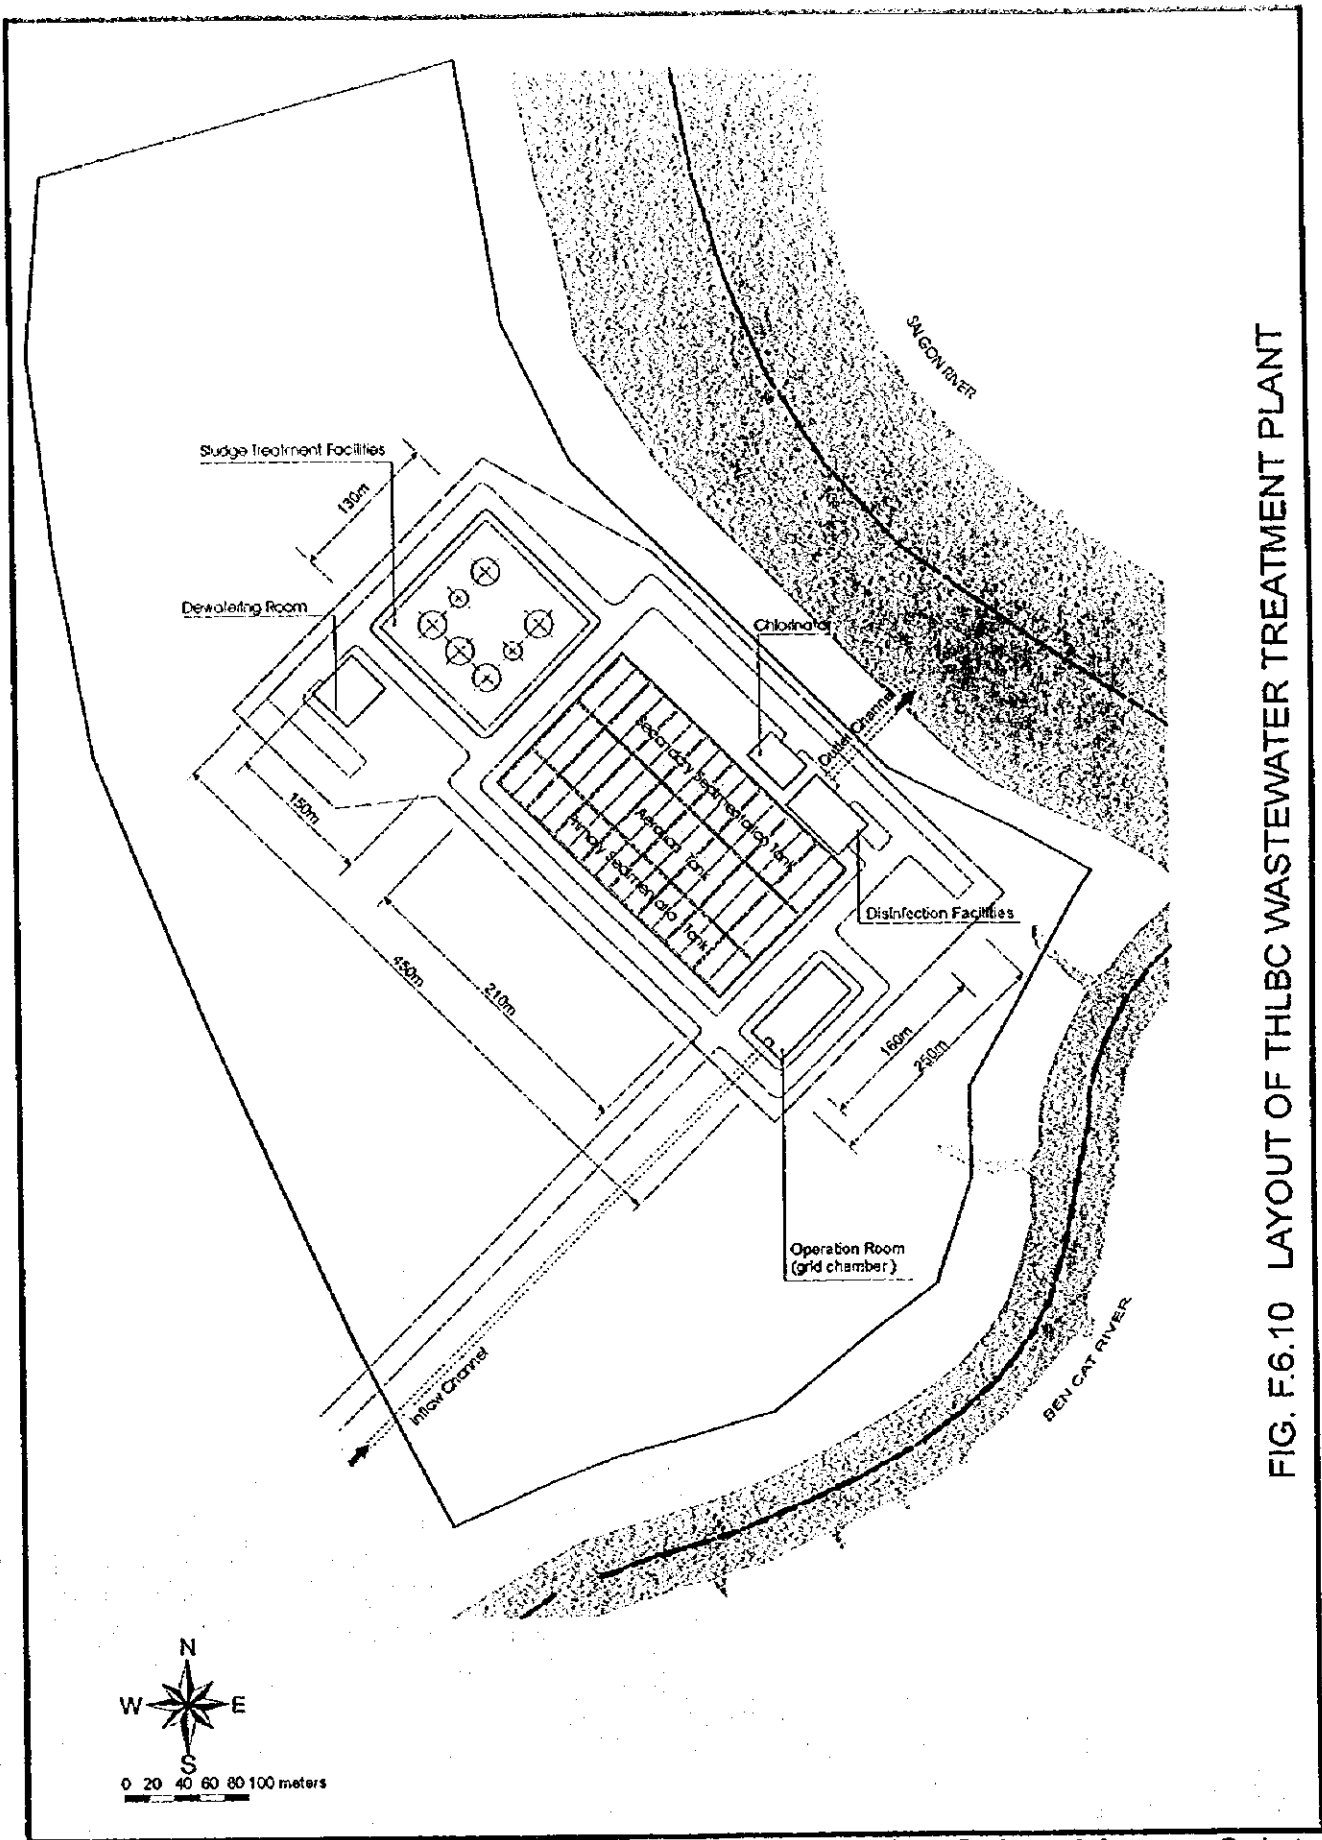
LAYOUT OF THLBC WASTEWATER TREATMENT PLANT
